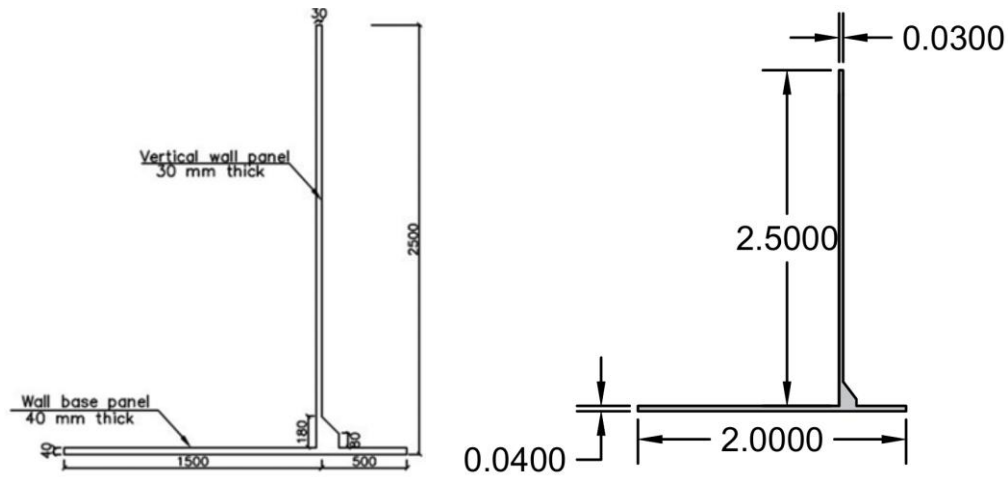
Cross-section of the precast UHPC cantilever retaining wall
